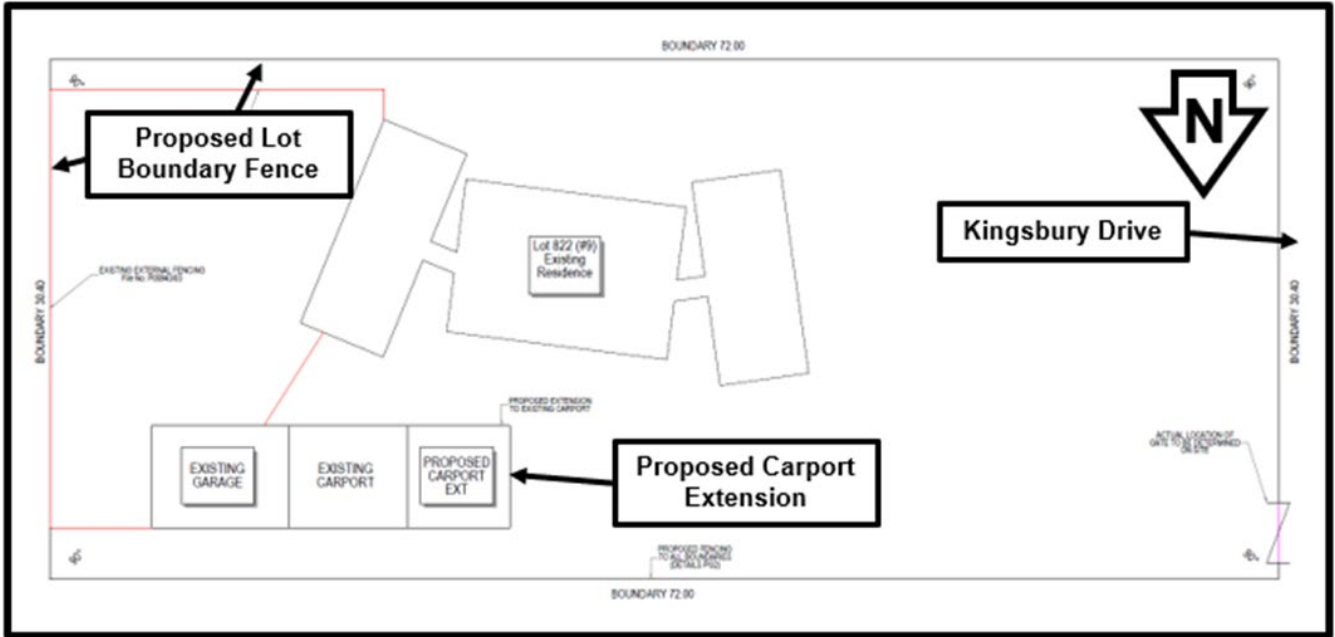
Site plan depicting proposed carport extension and lot boundary fence to all boundaries
